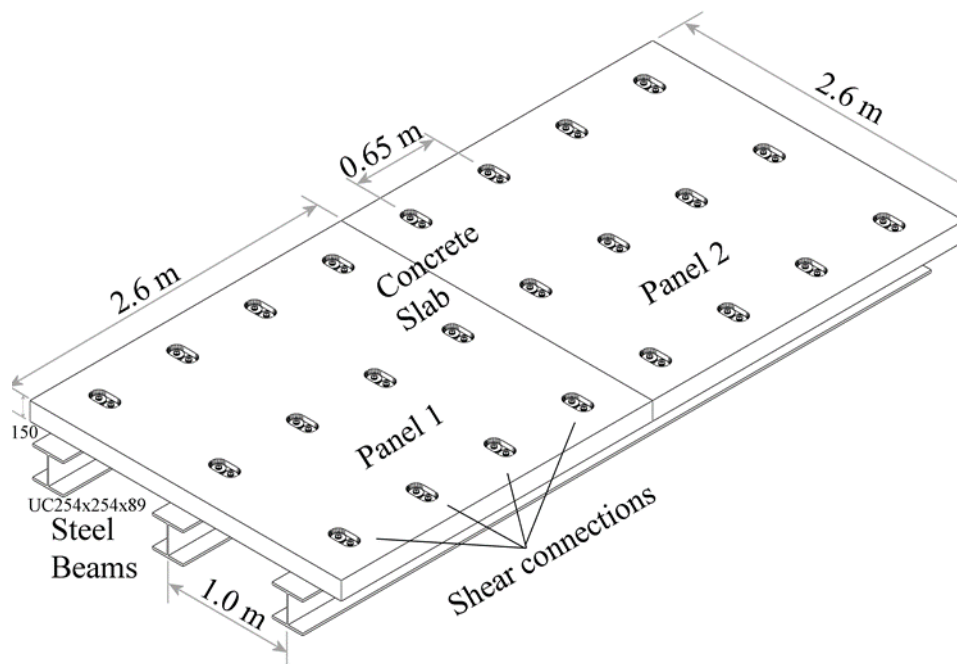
Precast steel-concrete composite bridge using the novel shear connector
